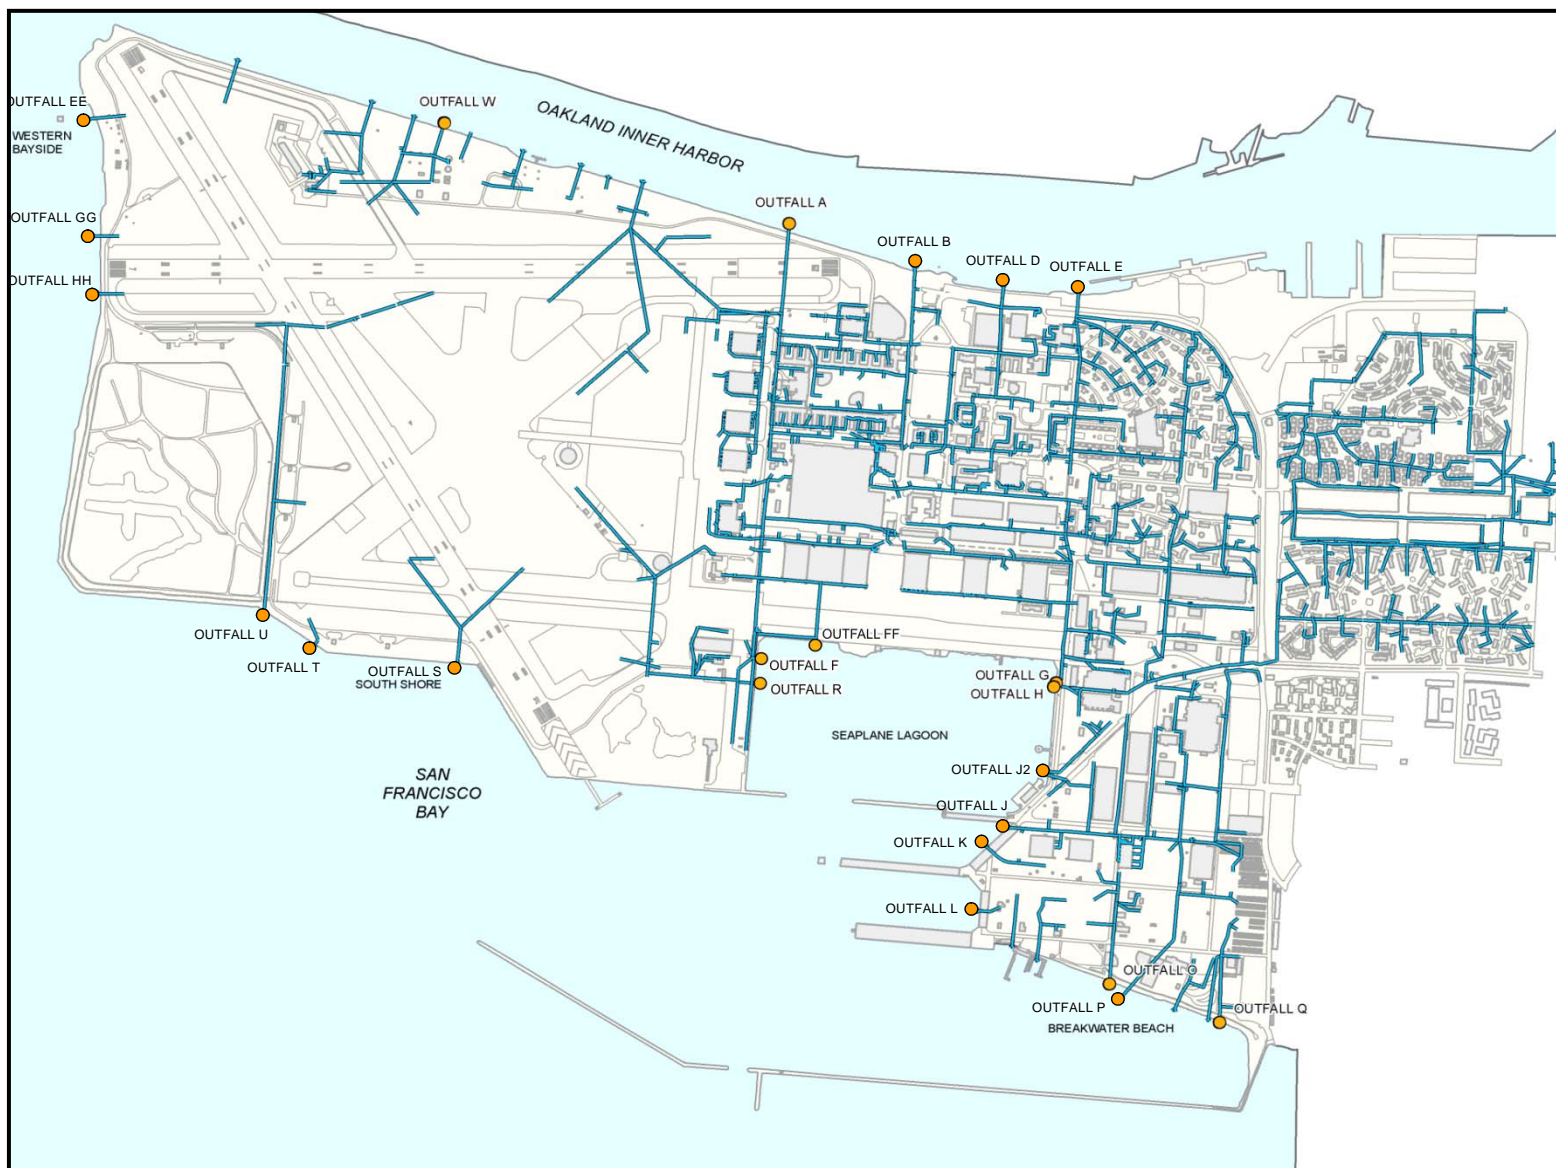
Storm Sewer Lines and Outfalls at Alameda Point
